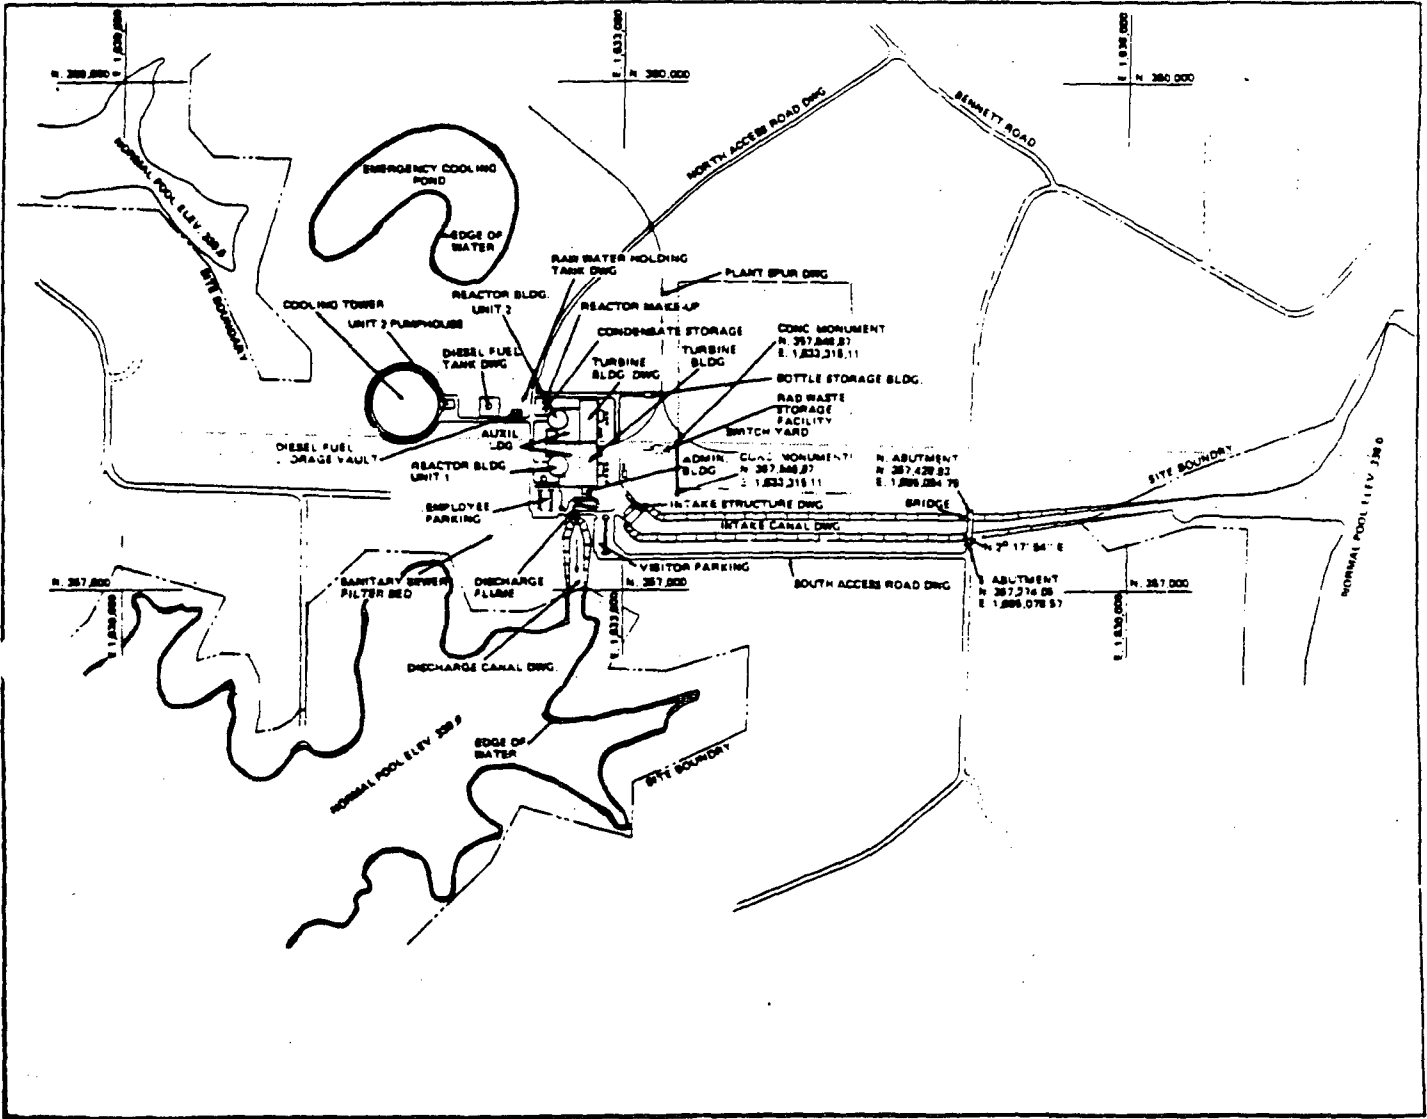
Site layout showing the location of the Emergency Cooling Pond. (Ref. 6-2).
